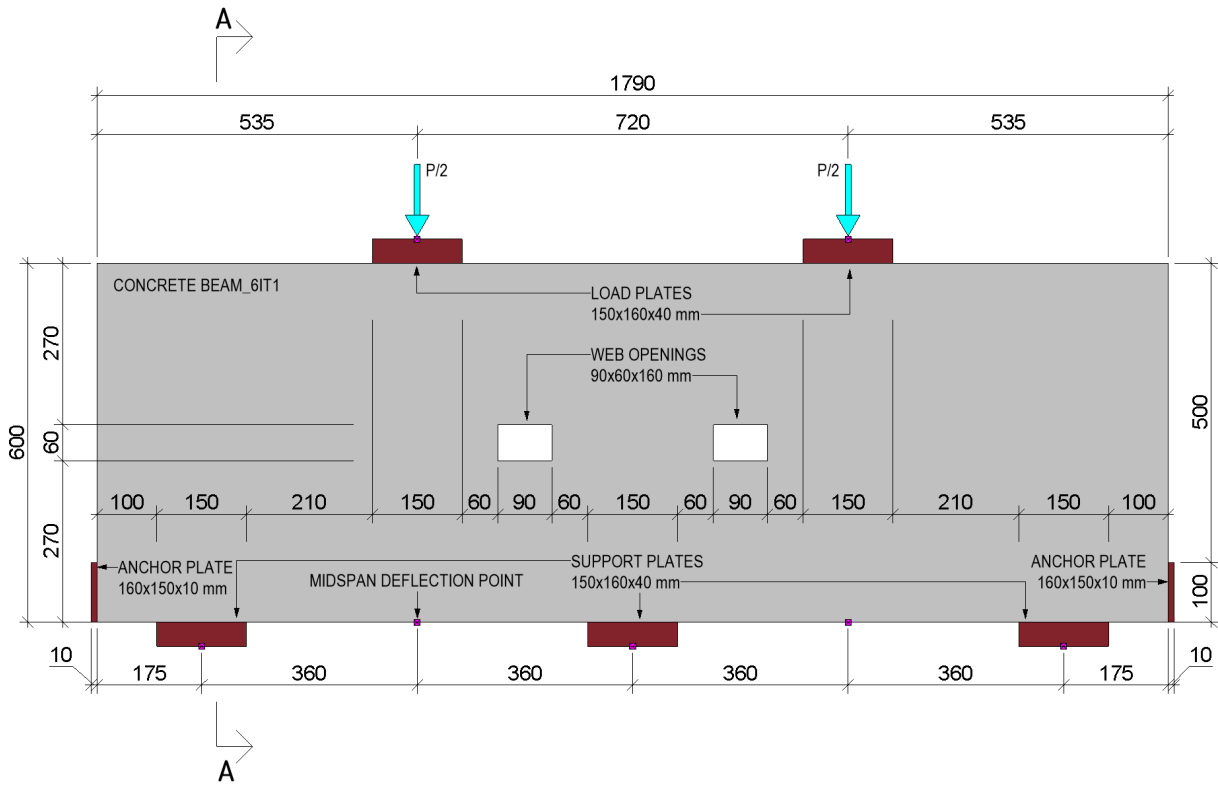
6IT1. Geometrical dimensions given in mm. Modelling tool [Autodesk Inc., 2018].
